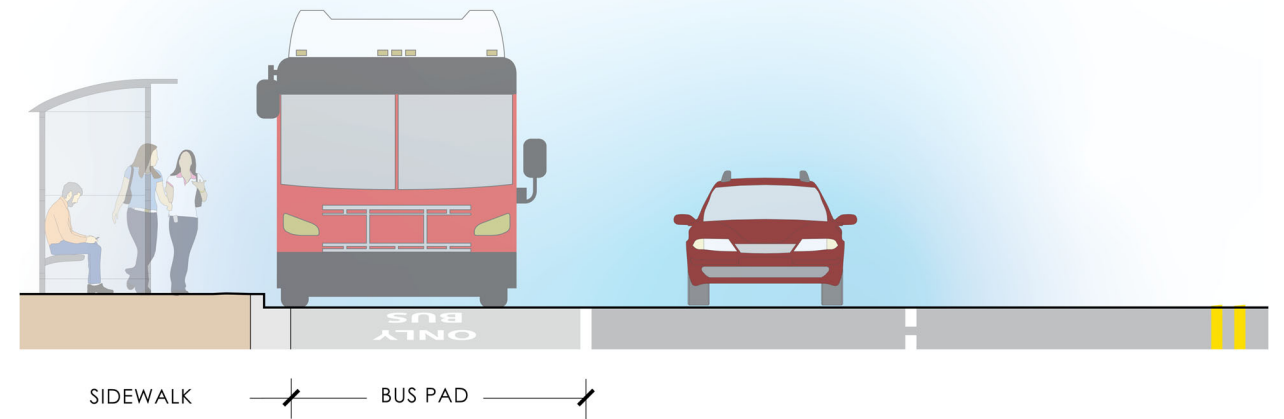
BUS PAD THROUGH THE LOCATION SECTION VIEW
